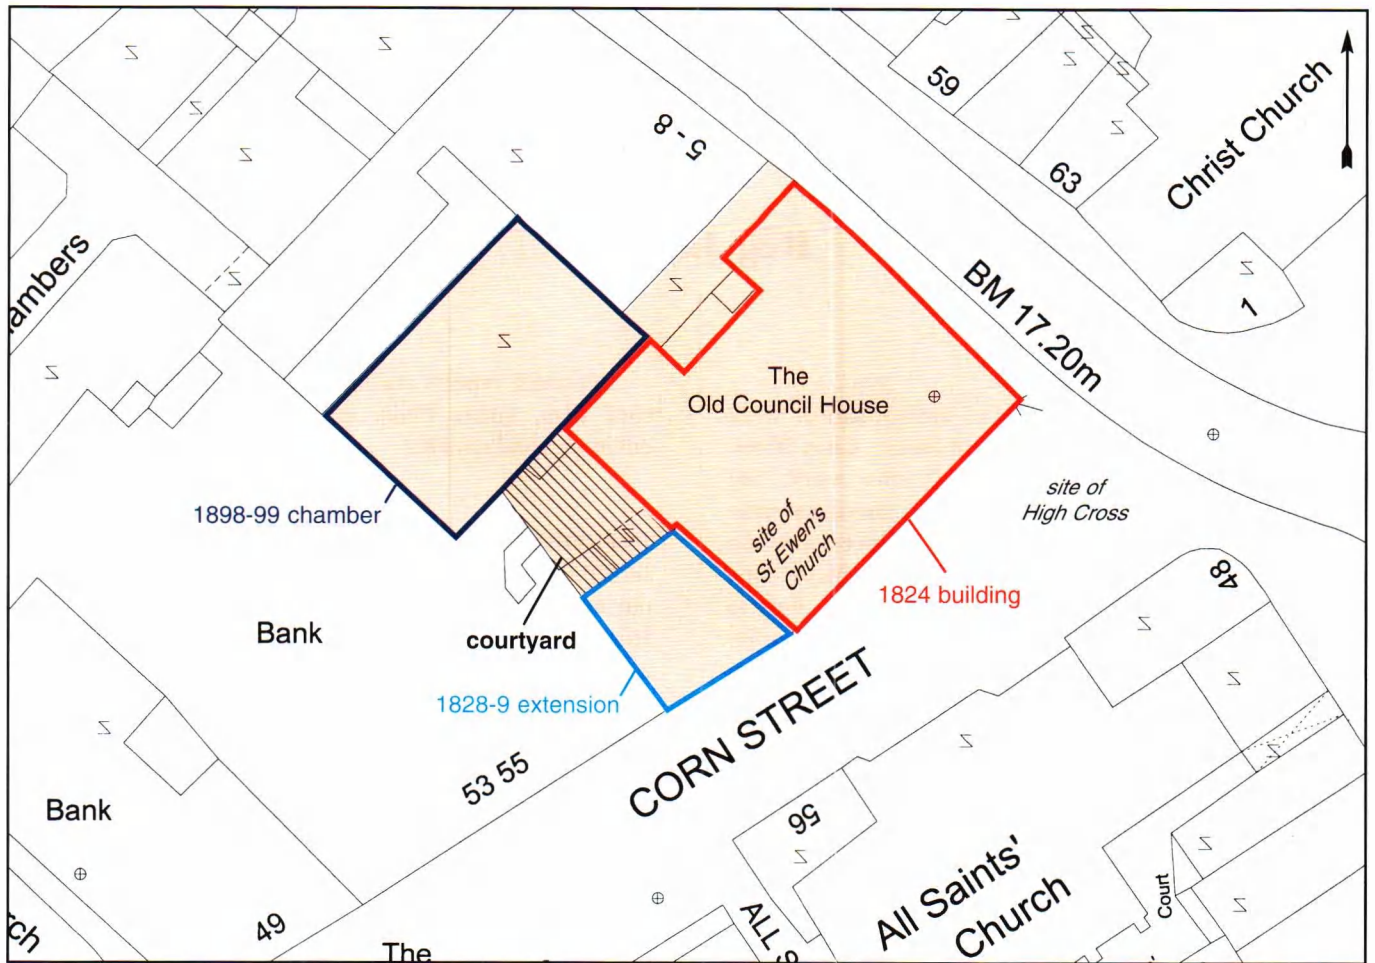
Ground floor plan of the Council House showing building phases, scale 1:500.
